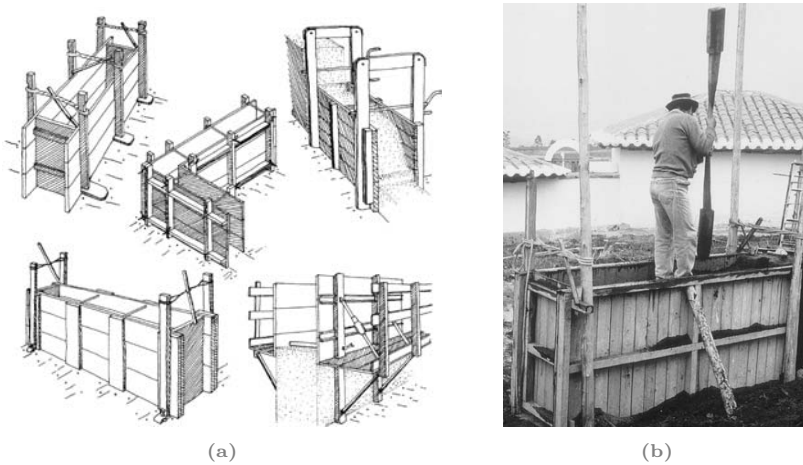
Traditional rammed earth building technique: (a) wooden formwork and (b) manual ramming process [1].
